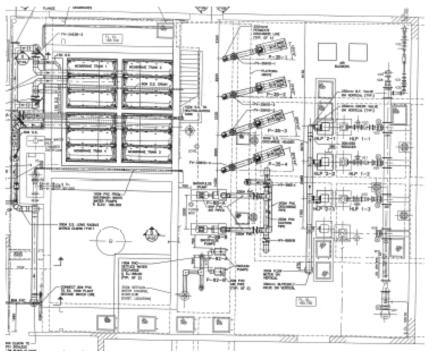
and 3.14 show the original plant layout, tankage, and the final plant arrangement.
